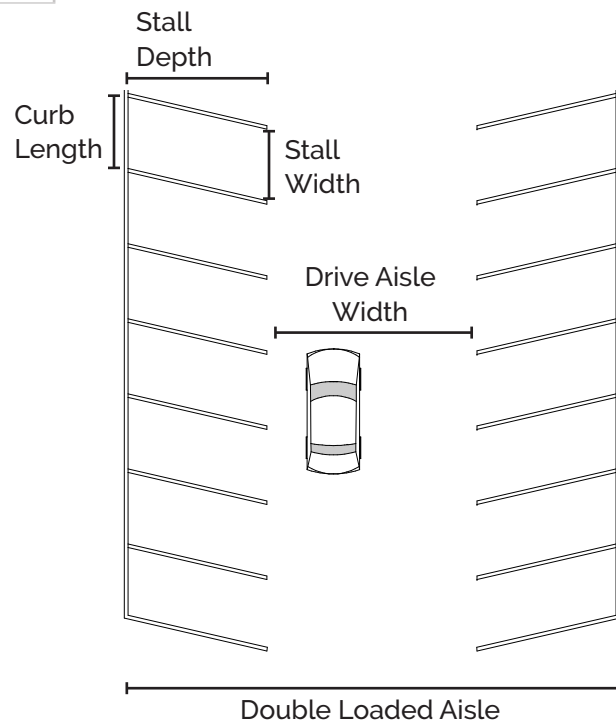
Parking Space and Drive Aisle Dimensions.
